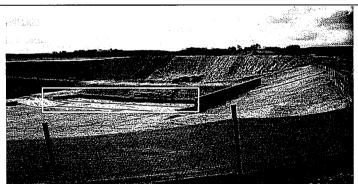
Long Valley Wash bridge (right). Insert shows earthen berm/dyke constructed in natural water way which is a violation of the construction storm water permit. Natural water way is used as a BMP.
